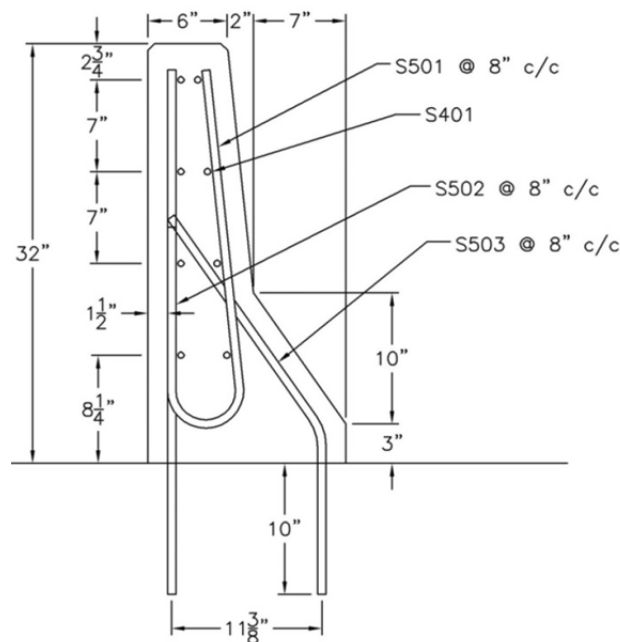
New Jersey Barrier Used in Crash Test with 10000S Single Unit Truck [48]
